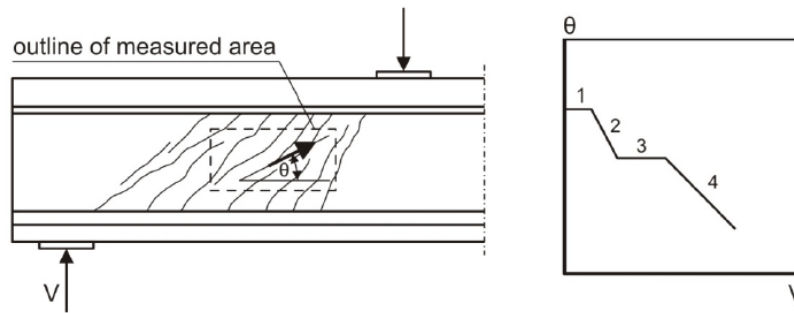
Angle of inclination of the concrete compression struts θ in a concrete beam (Reinhardt & Walraven, 1982).
